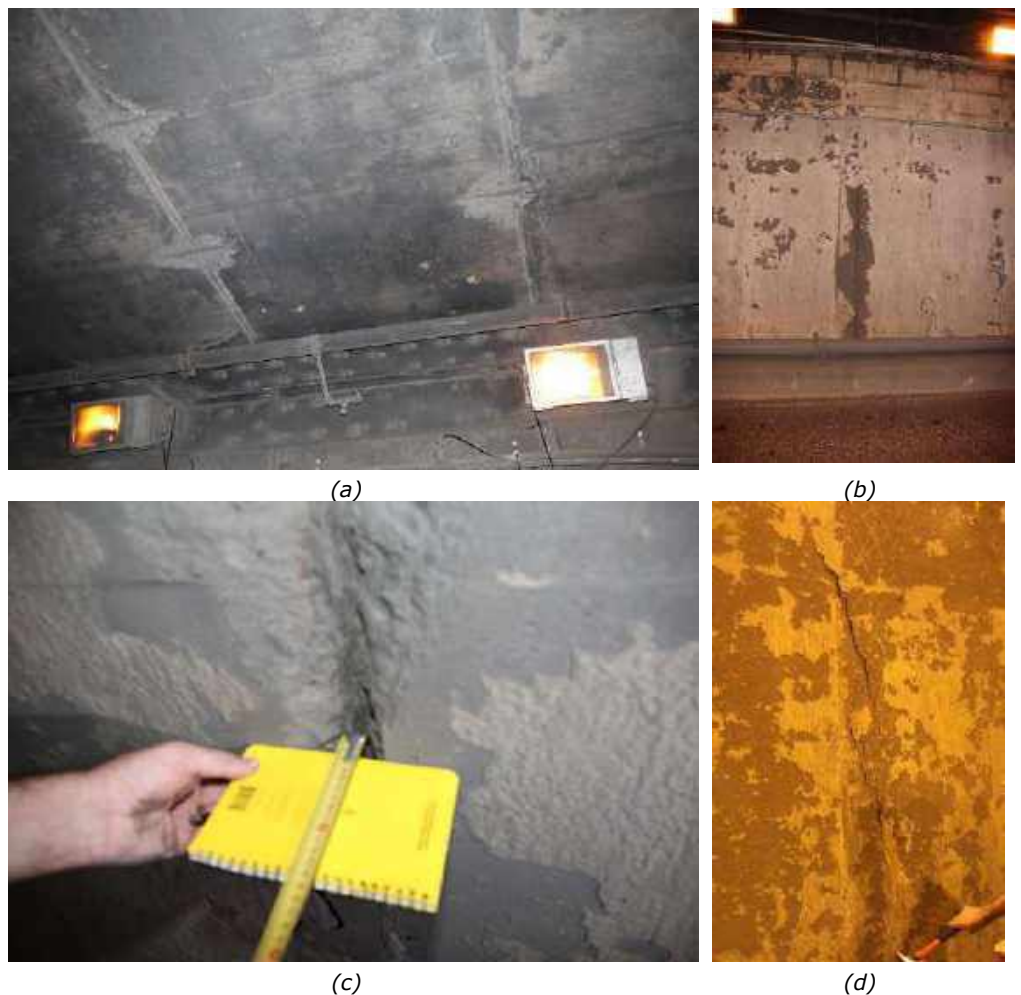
Examples of visual signs of reinforcement corrosion including delamination and/or spalling at (a) the soffit in Element I, Door 7/8 showing spalling at the transverse construction joints, (b) the central wall in Element V north of Door 28, (c) the central wall in Element II, South of Door 13, and (d) the central wall in Element III north of Door 18.
